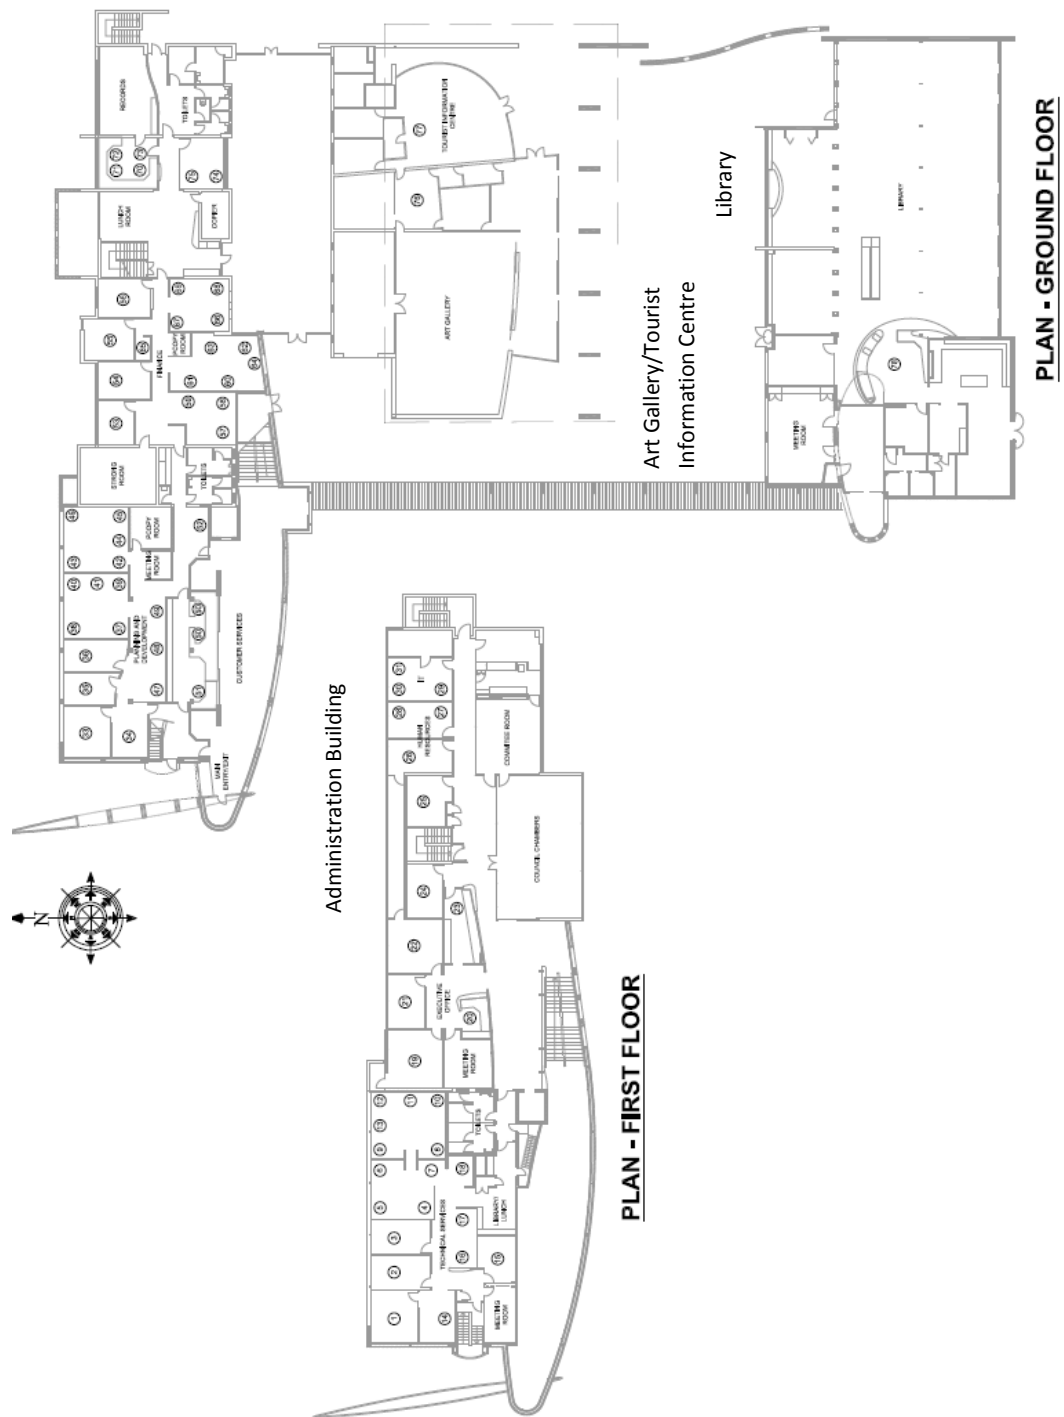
Floor Plans of Administration Building, Art Gallery/Tourist Information Centre and Library. Note that the buildings are presented in correct positions relative to one another. Courtesy SDRC.
